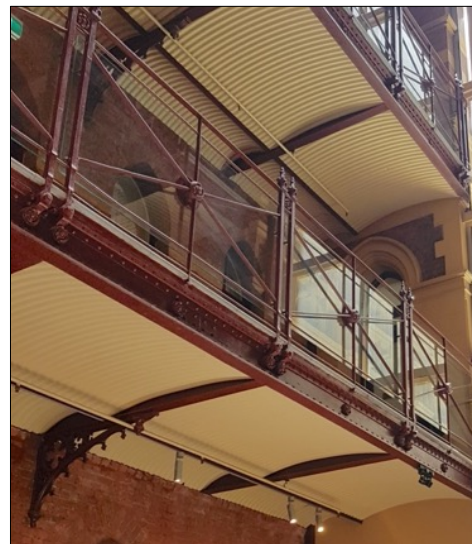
(right) Balcony to east elevation showing vaulted corrugated iron floor supported on iron beams and decorative cast iron brackets. Note modern glass panels mounted on the inside face of the original cast iron balustrade.
